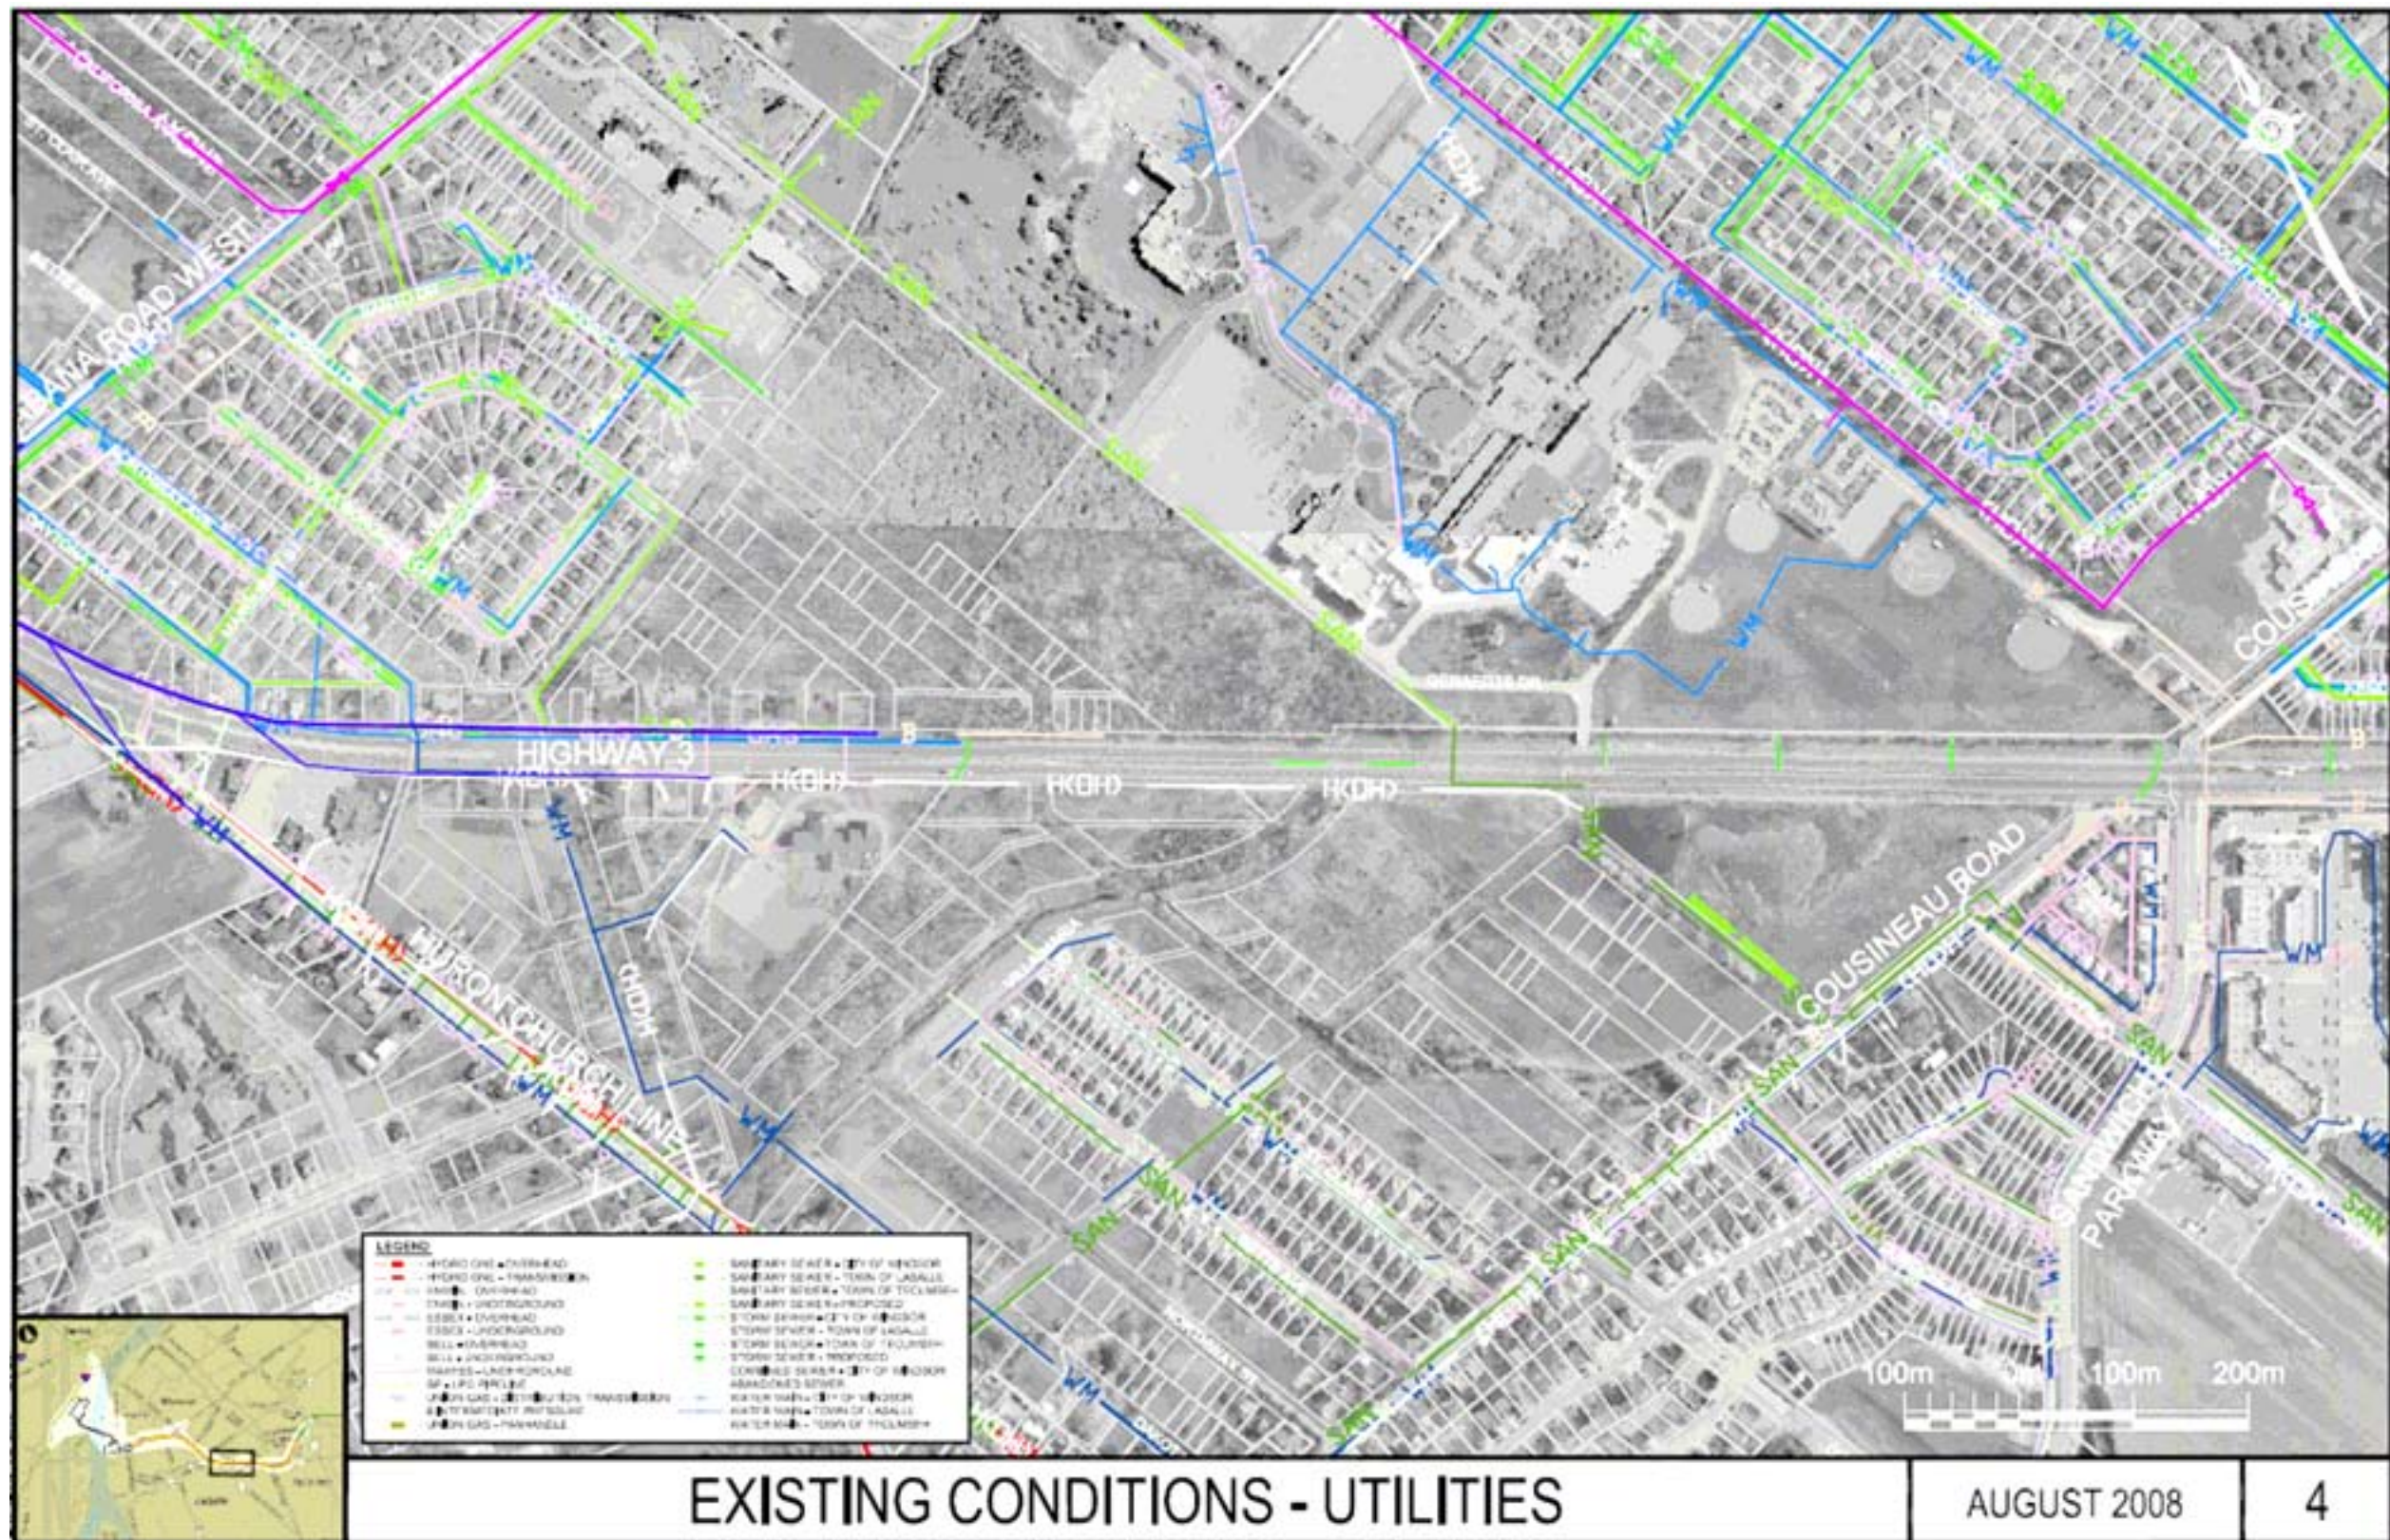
E – EXISTING UTILITY CONDITIONS (COUSINEAU ROAD TO HOWARD AVENUE)
